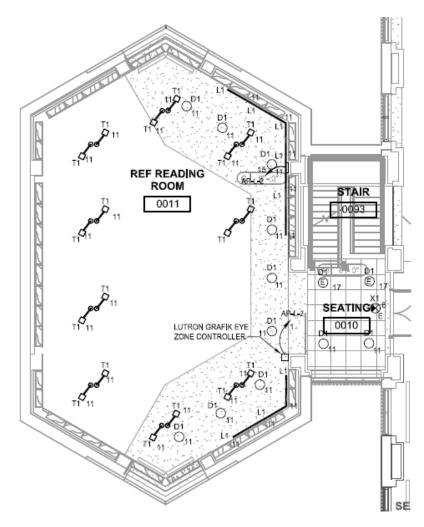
| Reference Reading Room - Lower Level Lighting Plan
